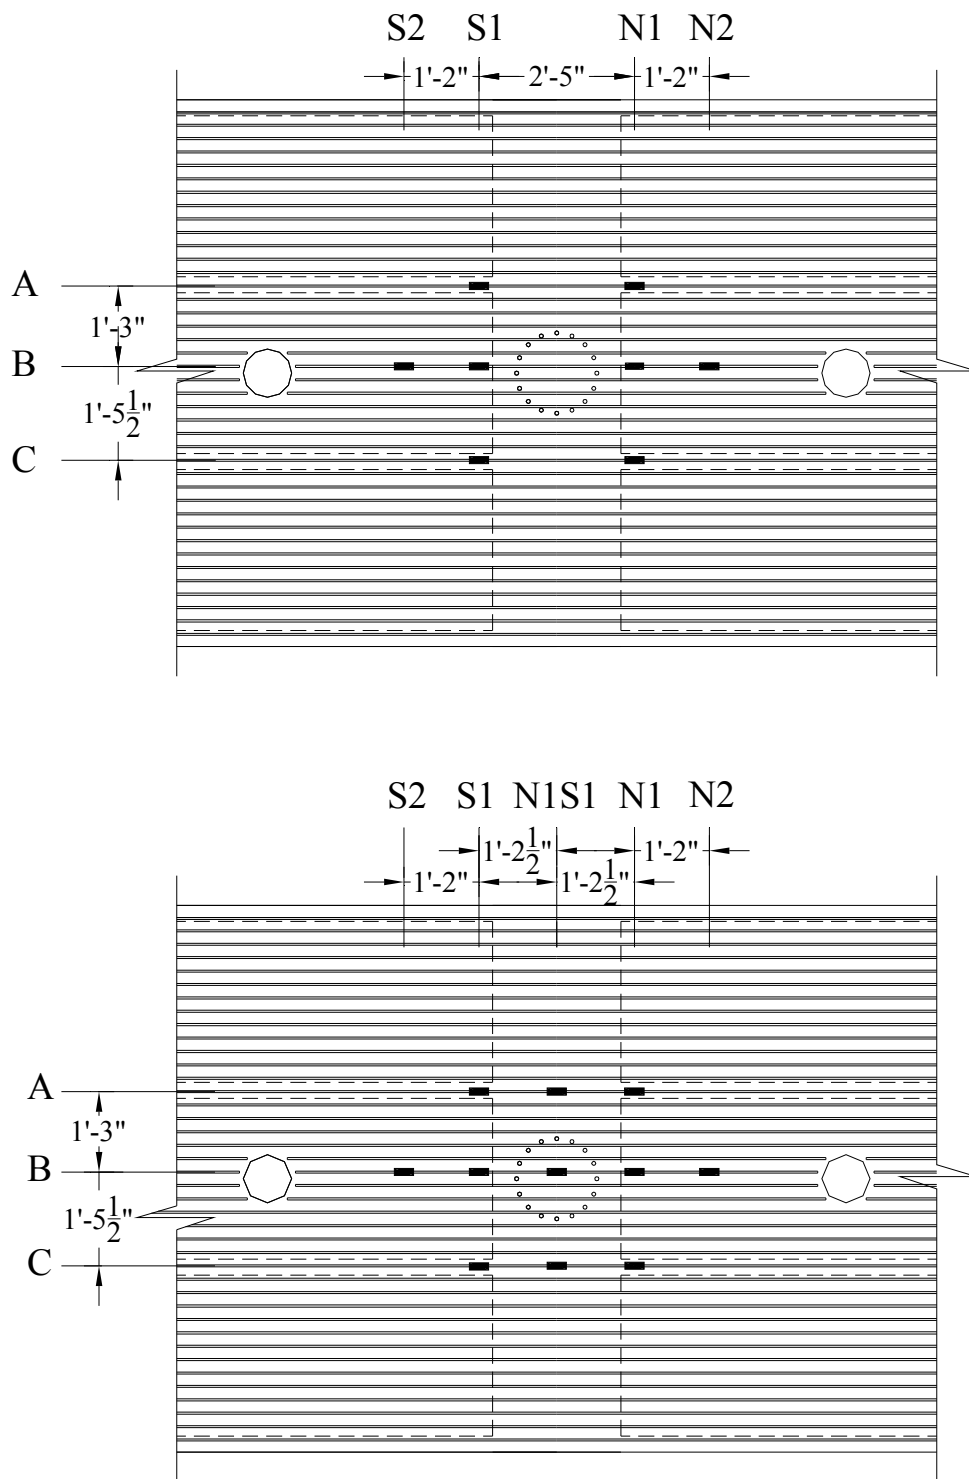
Layout of strain gauges used for the box-girder soffit slab (top) and deck slab (bottom) longitudinal reinforcement
